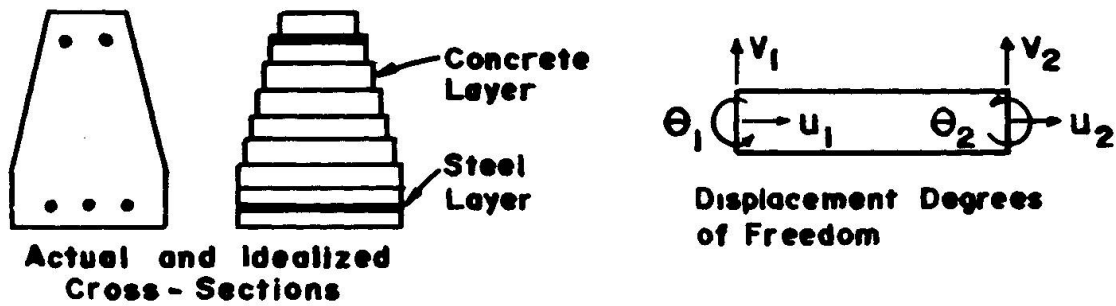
LAYERED PLANAR BEAM FINITE ELEMENT
